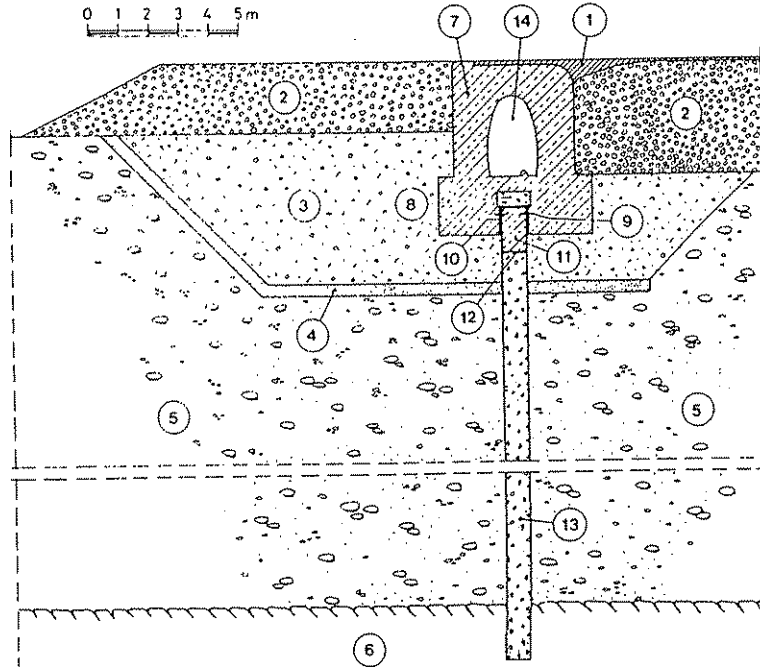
Face sealing of asphaltic concrete. Example of compressible foundation (adapted from Working Group of the Italian Committee on Large Dams 1988).
